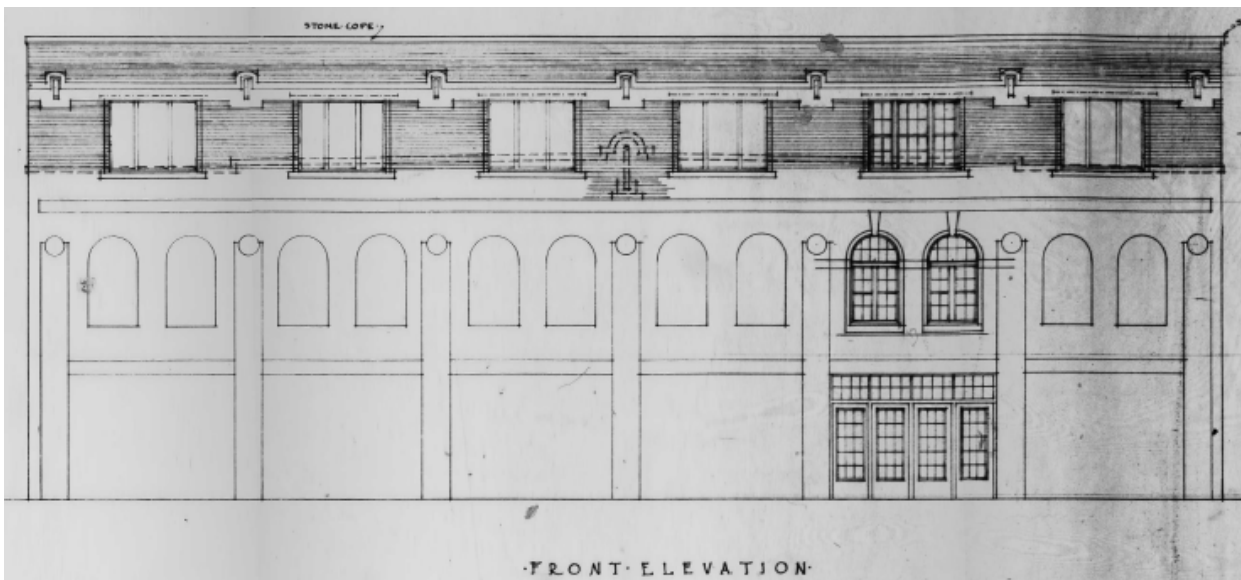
1925 principal (north) elevation drawing of 1497 Queen Street West by Chapman and Oxley Architects showing third storey addition. Note the design of the windows at the second and third storeys (Building Records).
